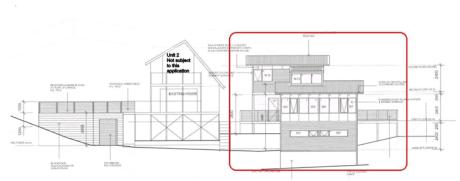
Front (South East) elevation (E3 Planning, 2022)
